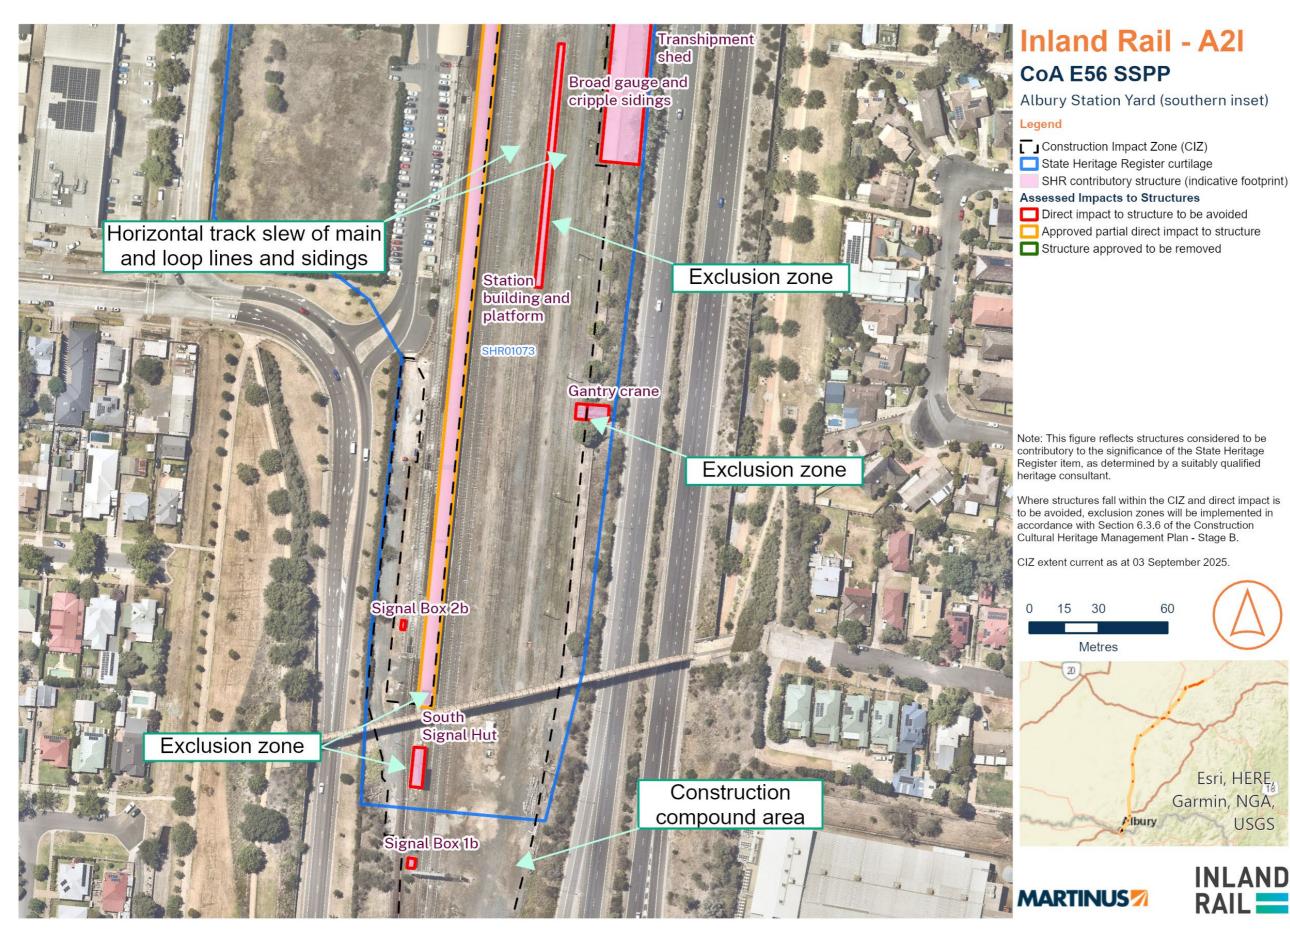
ALBURY STATION YARD - SHR ITEM 01073 CURTILAGE (SOUTHERN EXTENT)
